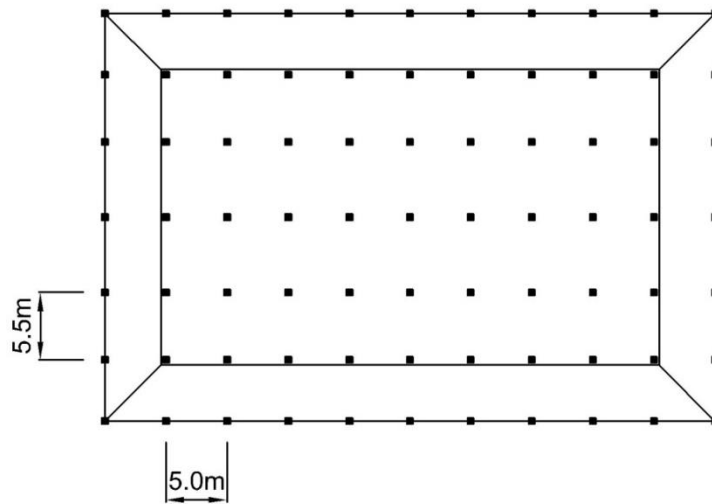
Foundation locations of the prototypical multi-family residential building
